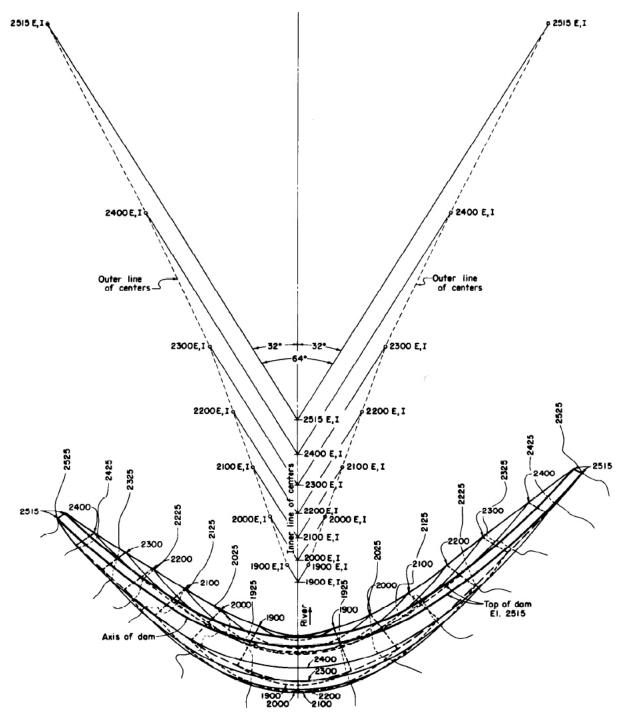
Layout drawings of a three-centered arch dam with uniform-thickness arches
